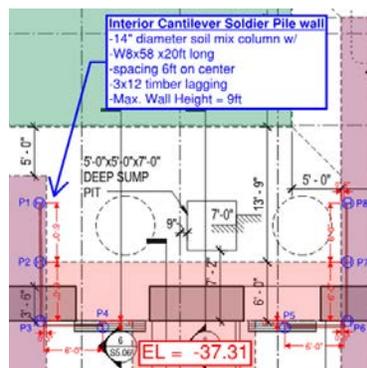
Drawings detailing shoring plan including layout of soldier piles and lagging
